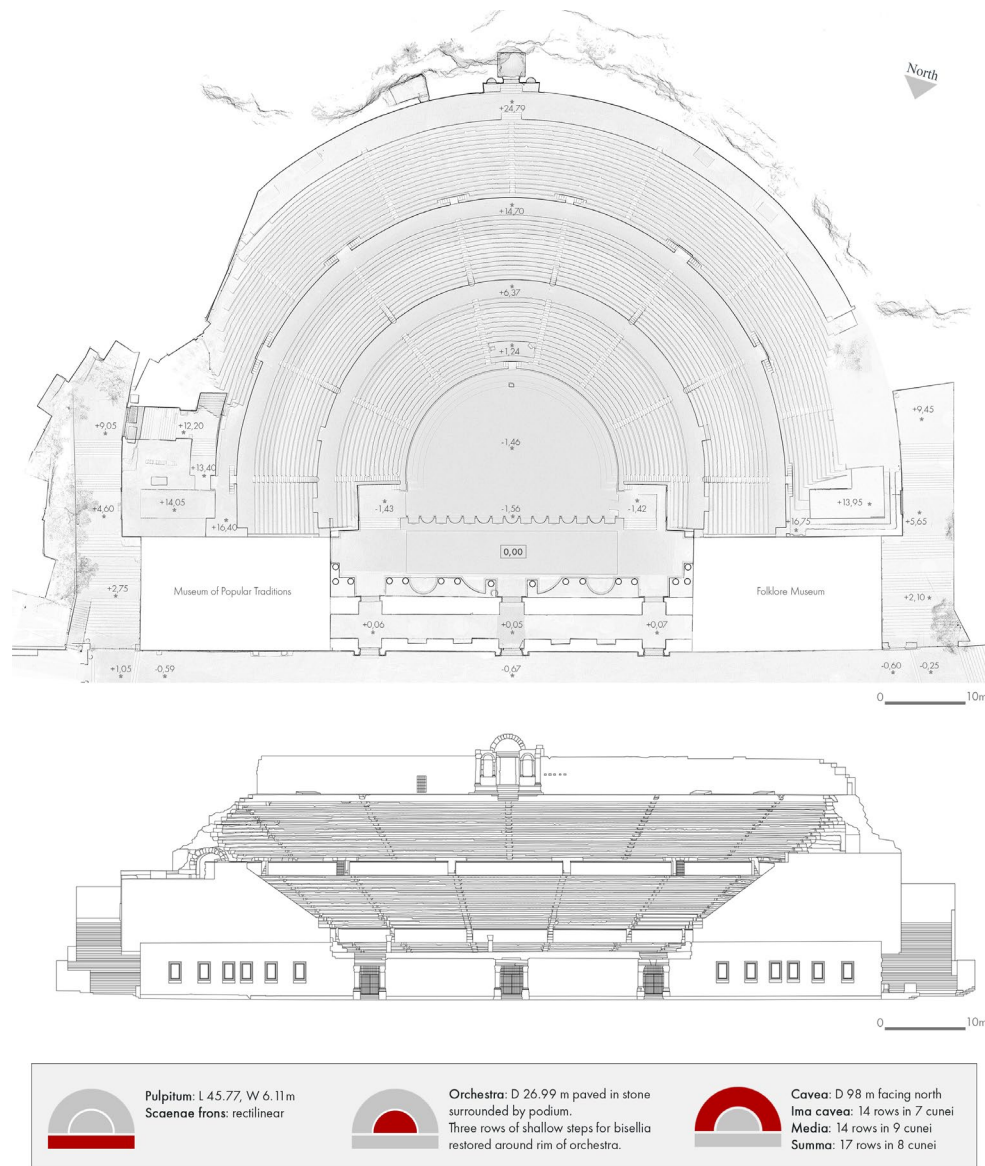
Architectural survey of the floor plan and façade of the theater.
